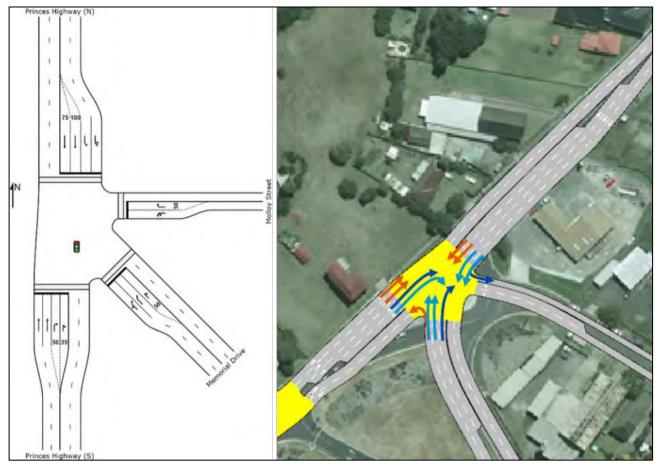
Consolidated intersection layout at Princes Highway/Molloy Street
